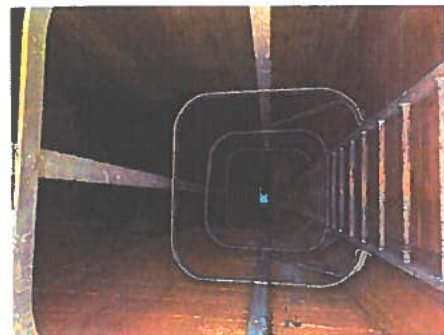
Pevensey Central Outfall - Inner chamber (Coast Road). North Sub-Chamber. Existing access arrangement.
